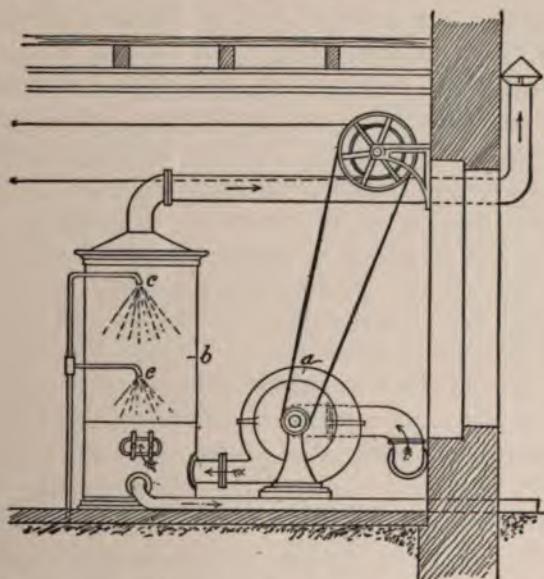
Apparatus for removing dust in manufacturing establishments :
